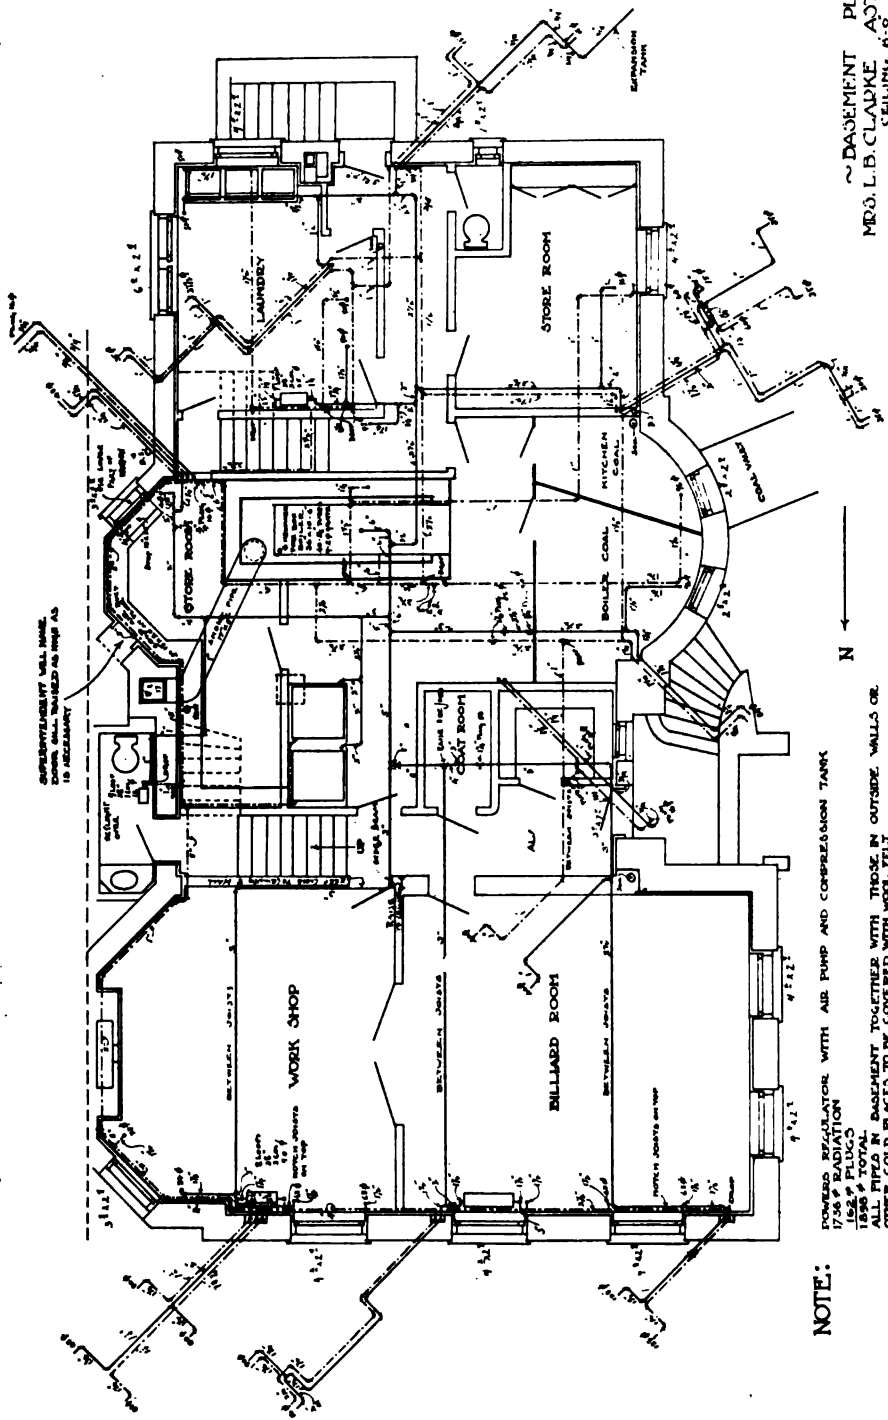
Dimensioned Sketches for Cutting Pipe.
